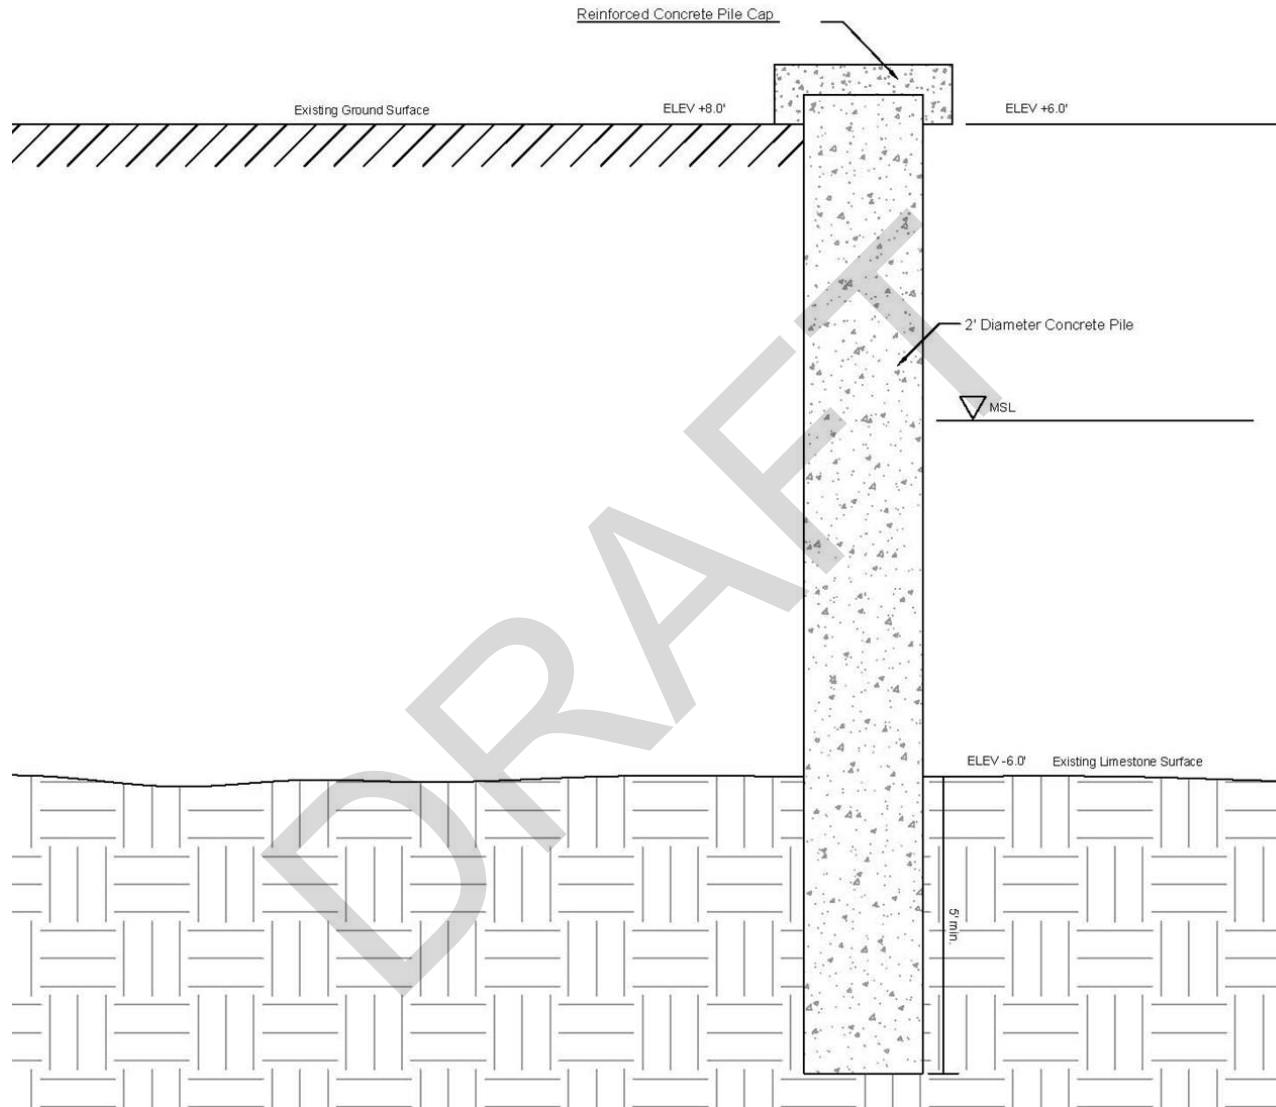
Secant Pile Seawall. Schematic of the proposed secant pile seawall design (Alternative 4). Schematic provided by USACE.
